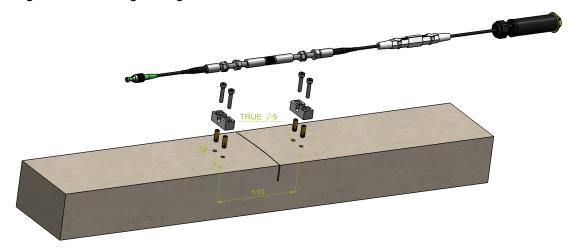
Mechanical installation for concrete crack monitoring
